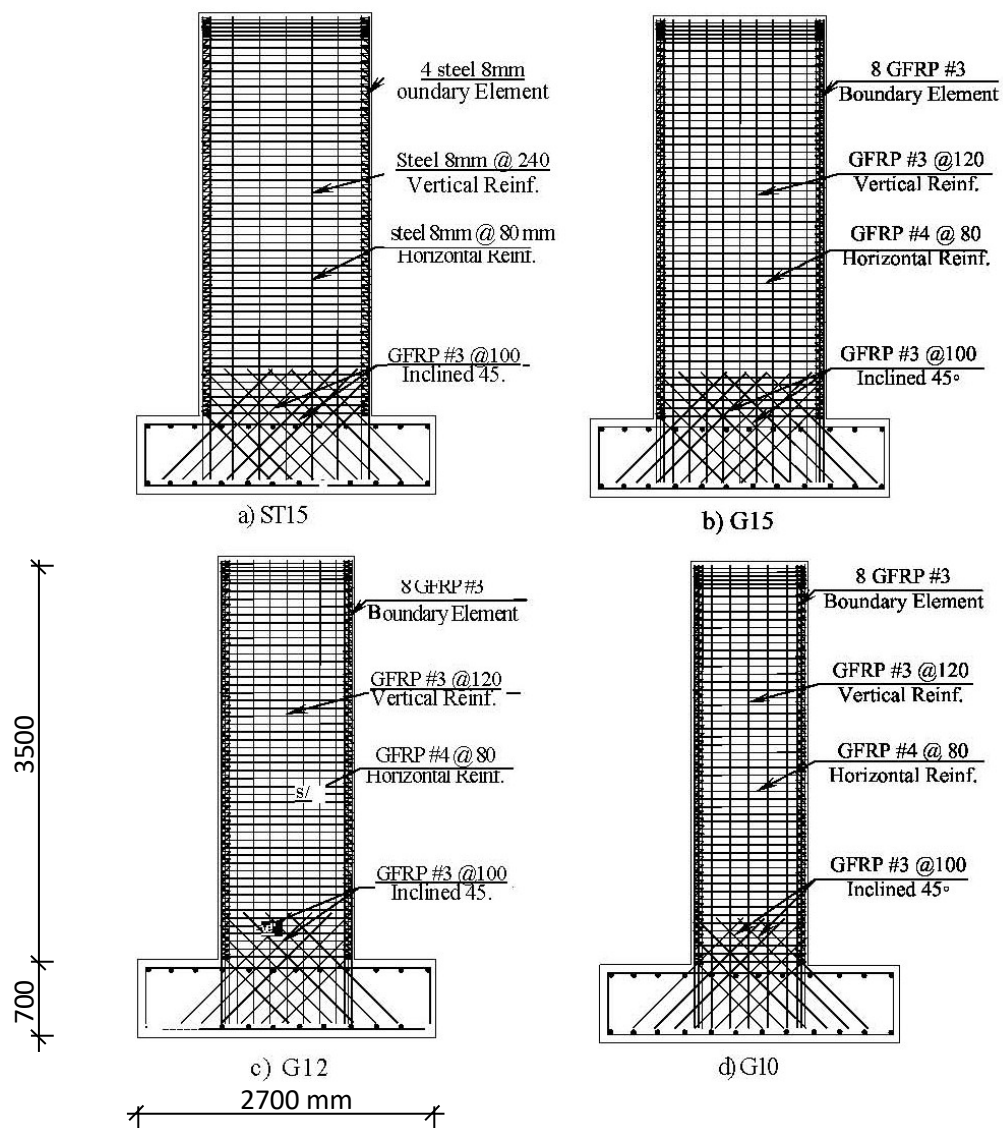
Concrete dimensions and reinforcement details (Mohamed et al.2014)
